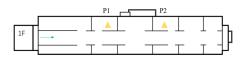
Measurement points layout plan for the 1st floor of the parking depot superstructure.
